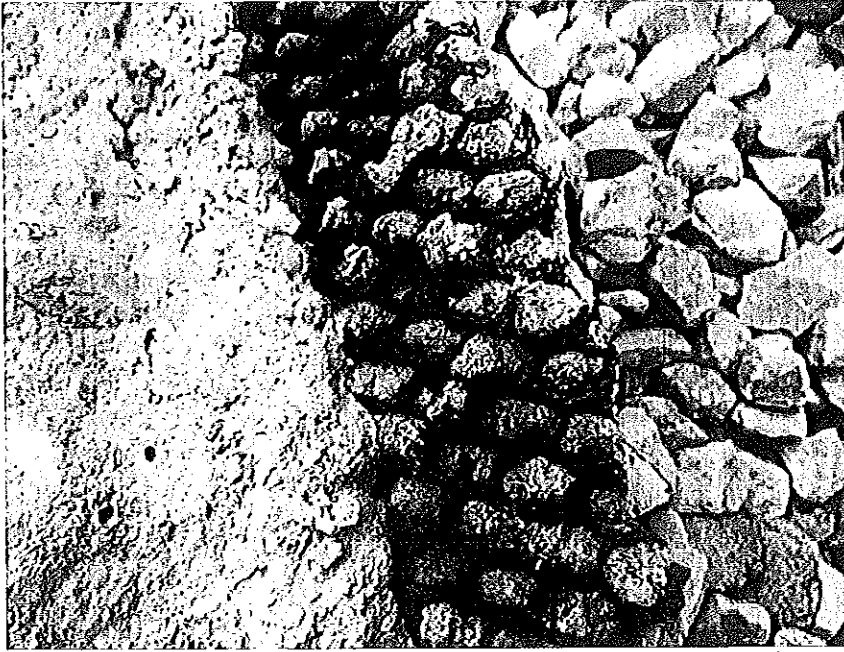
Close-up view of rusted diamond steel mesh reinforcement on broken piece of concrete adjacent to Tank 1.
